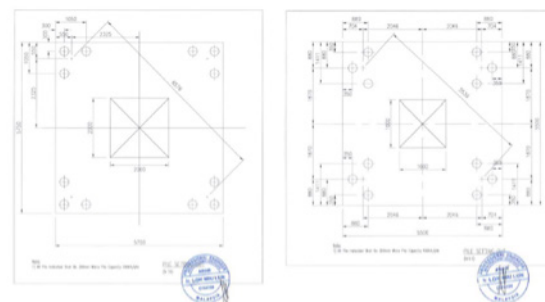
(a) TC1 Layout (b) TC2 Layout
